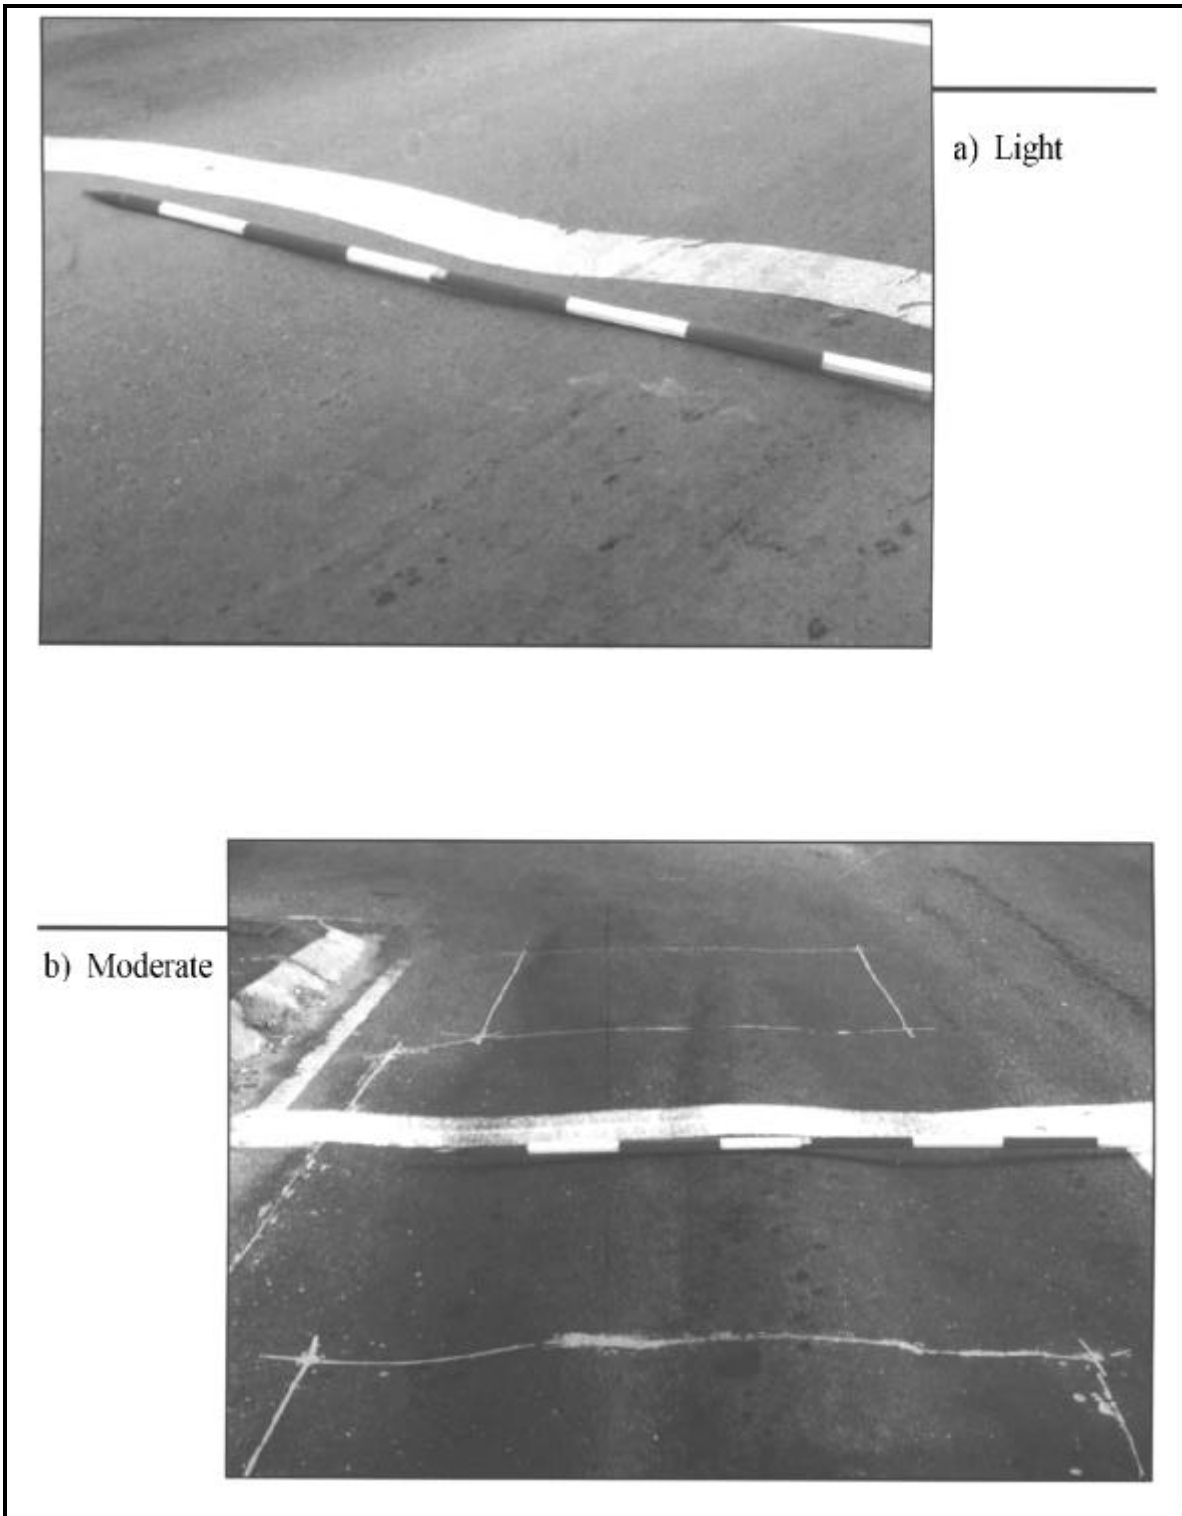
Photographs of typical permanent deformation (rutting) in HMA surface.⁽²⁶⁾
